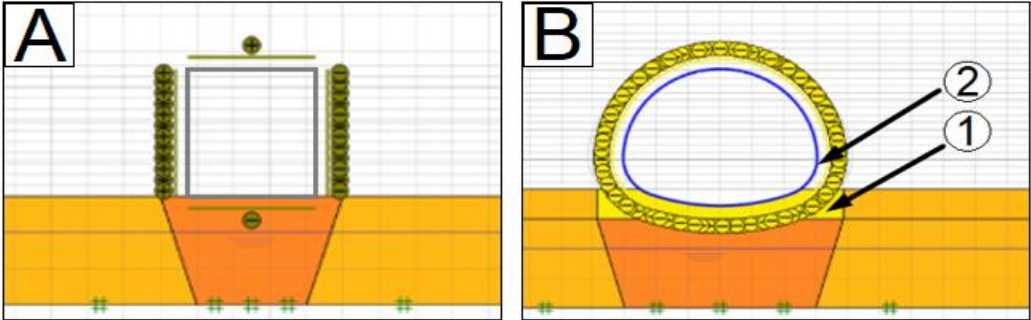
Comparison: Constructing A) a rigid concrete culvert and B) a flexible steel-soil composite culvert
